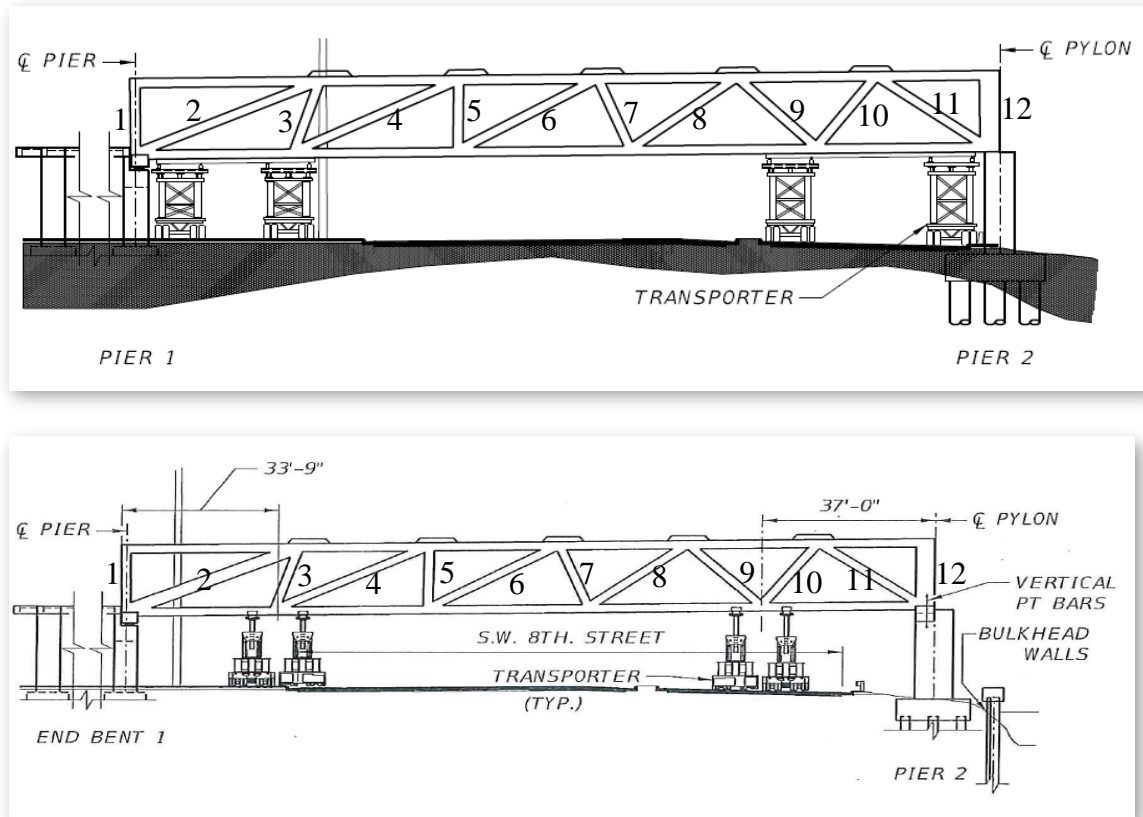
Placement of SPMT support: Proposal (upper) and RFC (lower).⁶⁵
